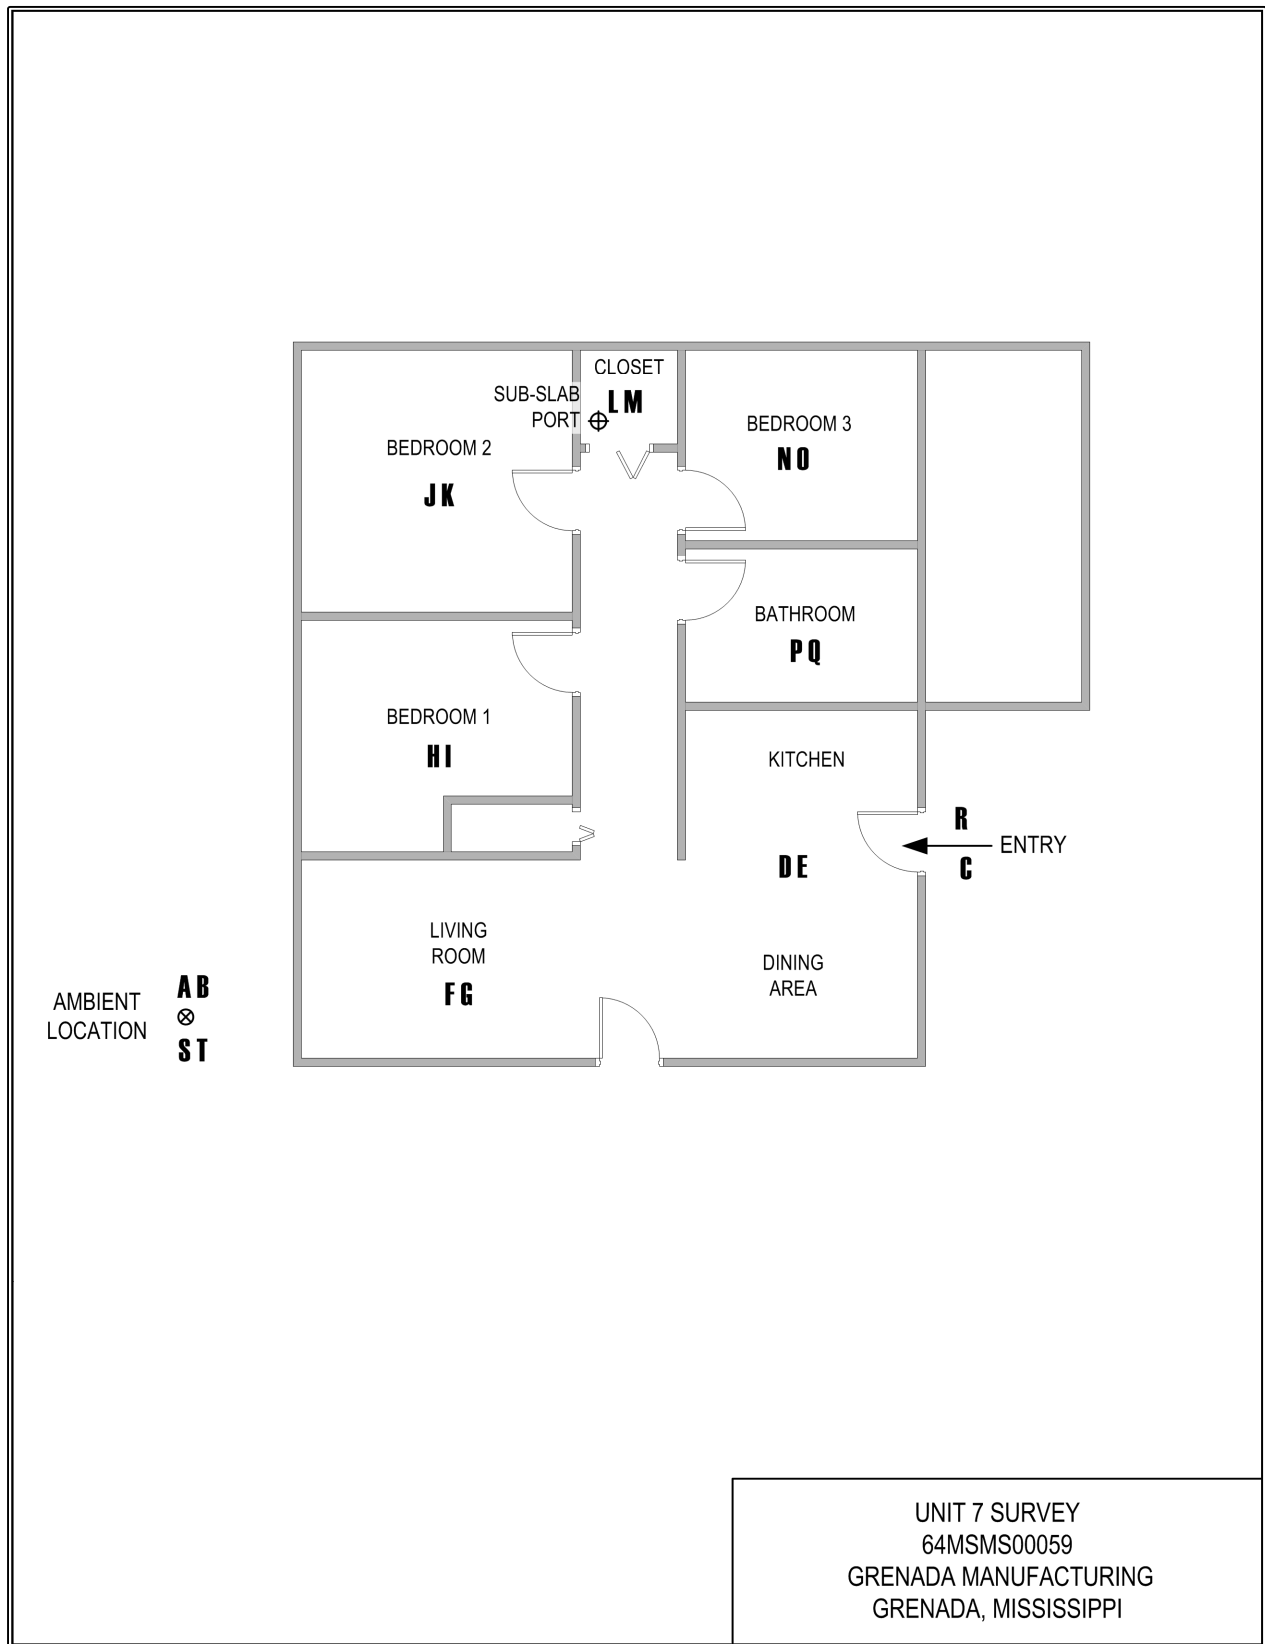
Unit 7 Survey Floor Plan, 64MSMS00059
